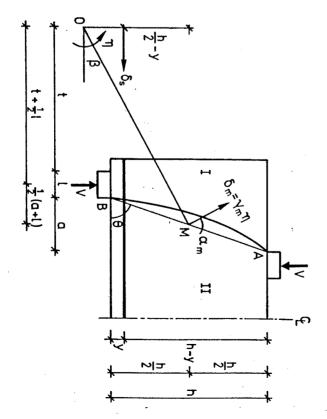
Failure mechanism for shear span subjected to concentrated load.
